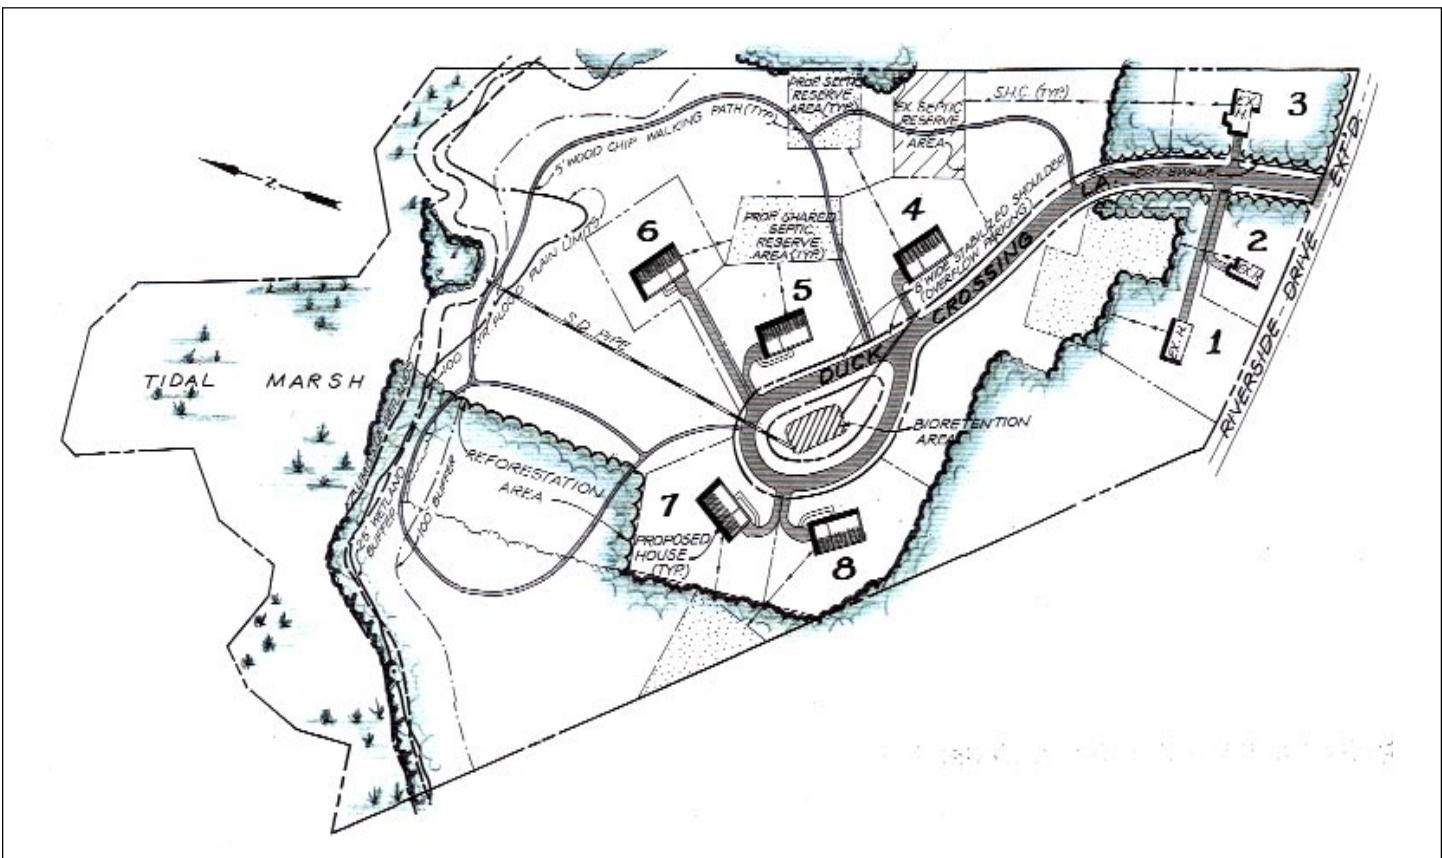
The Open Space Subdivision That Could Have Been Built at Duck Crossing (eight lots)
